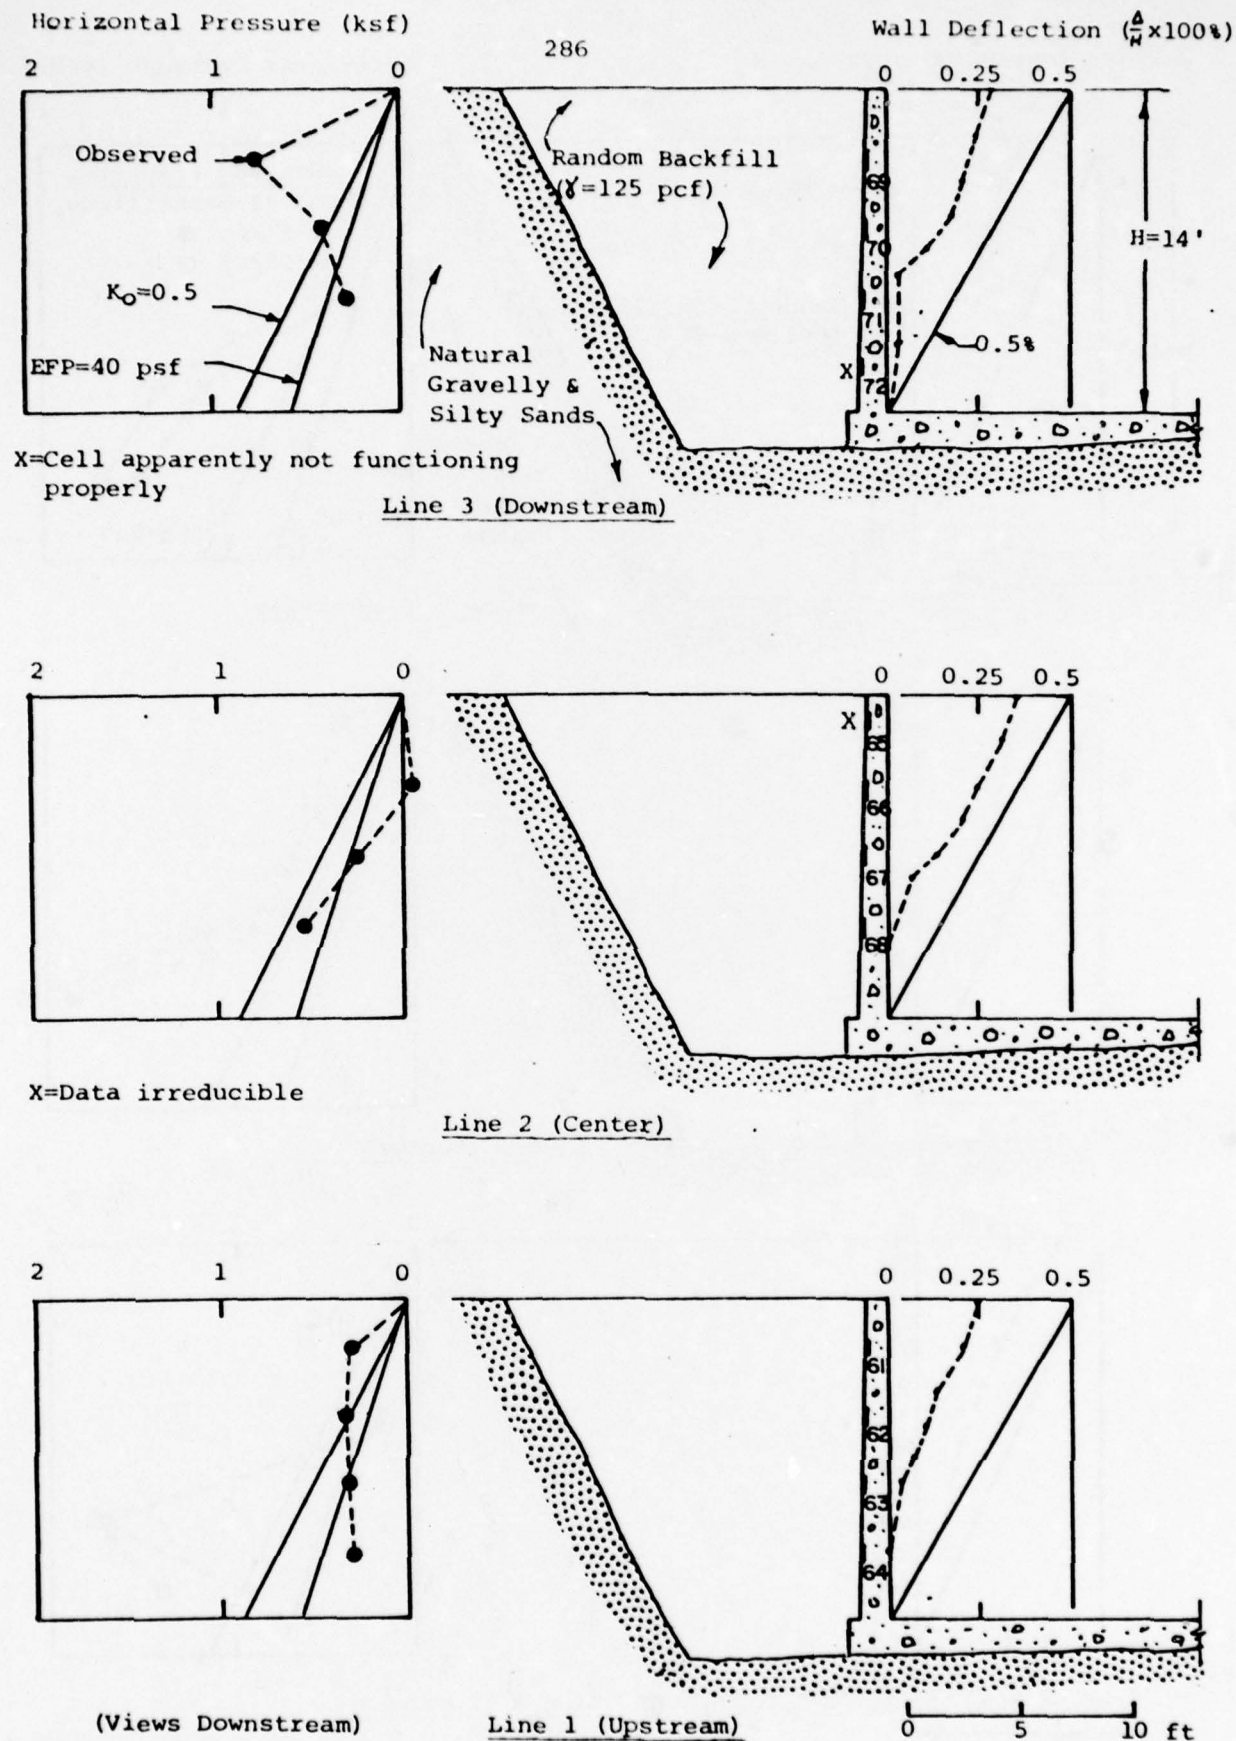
EARTH PRESSURES AND WALL DEFLECTIONS UPON COMPLETION OF BACKFILLING, WALL PANEL C, (STA. 91+00), SAN JOSE CREEK CHANNEL
